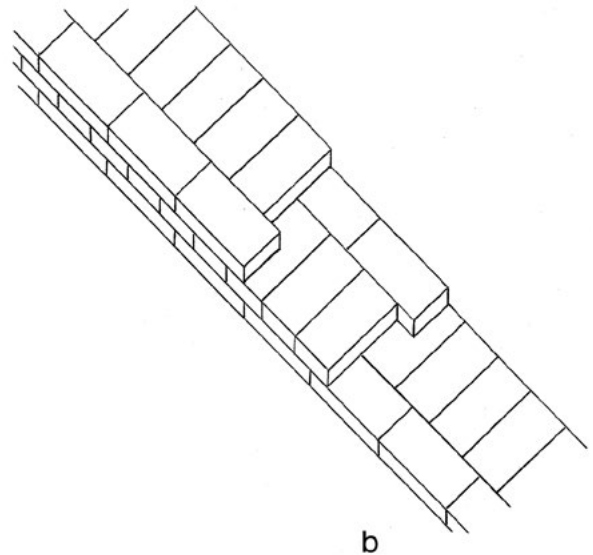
Foundation wall of the Maussoleion *peribolos* wall (drawing: P. Pedersen).
